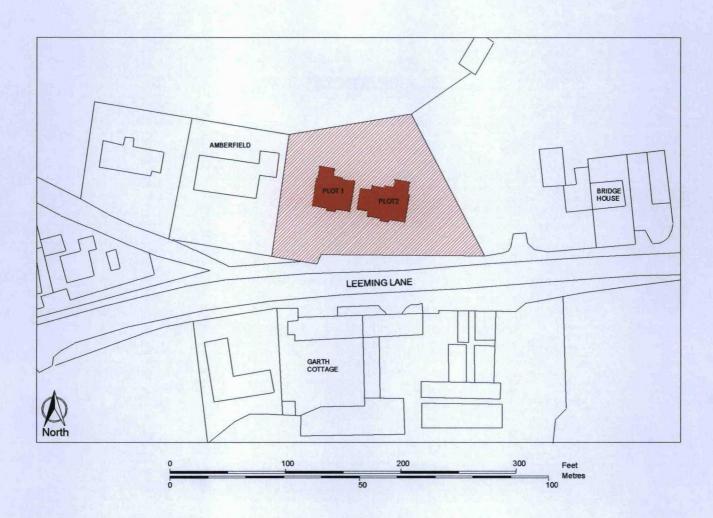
Detailed site location plan showing location of plots monitored. (Scale 1:1000).
